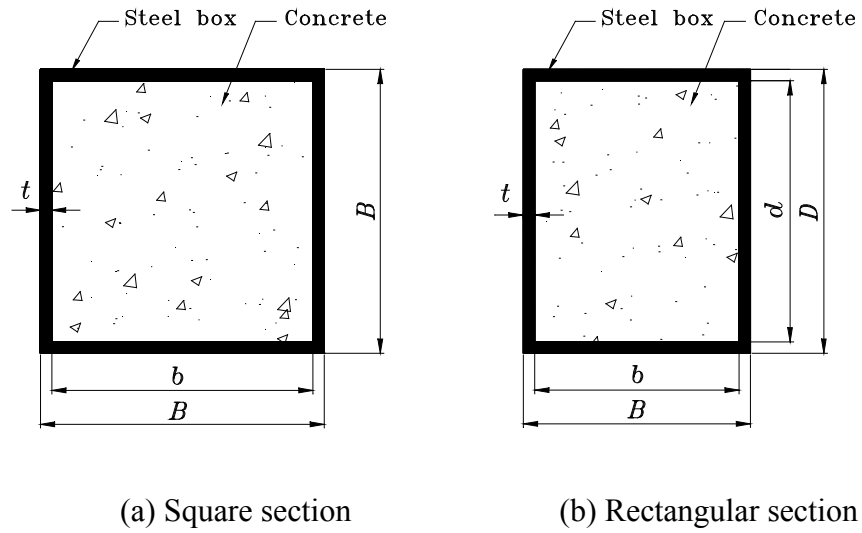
Concrete-filled thin-walled steel tubular beam-columns.
